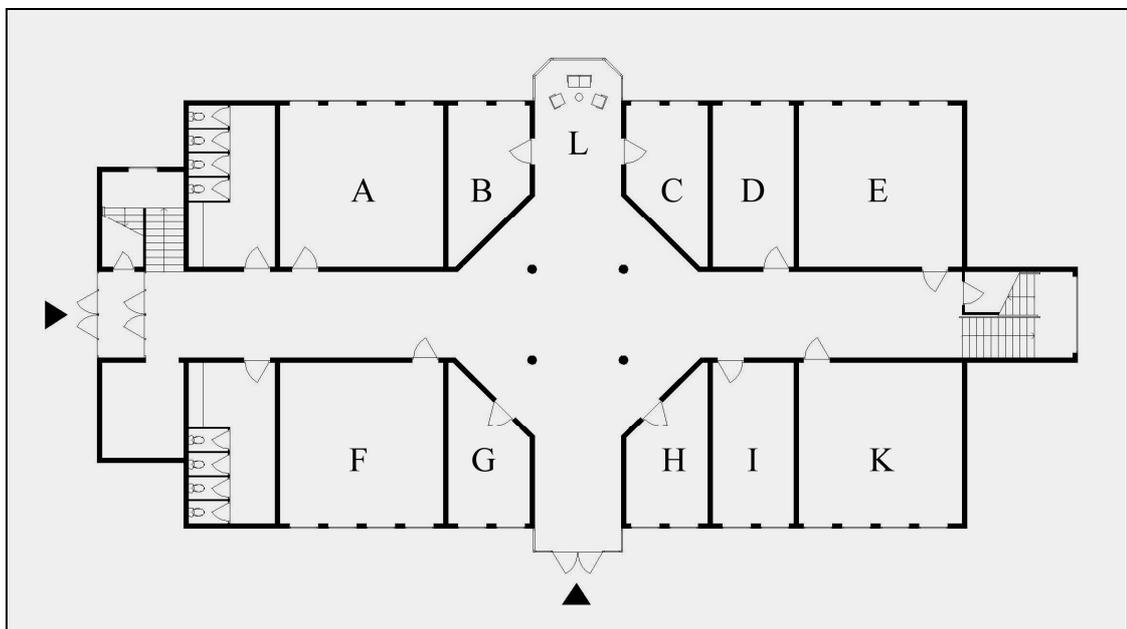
Ground floor plan of elementary school building (Building C) of Deniz ES. A-Teachers' lounge, B-Infirmary, C-Head of department, D-Meeting room, E-Art room, F-Kindergarten, G-Vice principal's room, H-Office of guidance counselor, I-Depot, K-Classroom, L- Seats.
